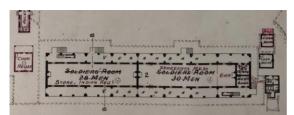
1906 G/F Plan, extracted from the 1906 Whitfield Barracks Skeleton Record Plan, sheet 2/3 (Source: TNA WO78#3744)
